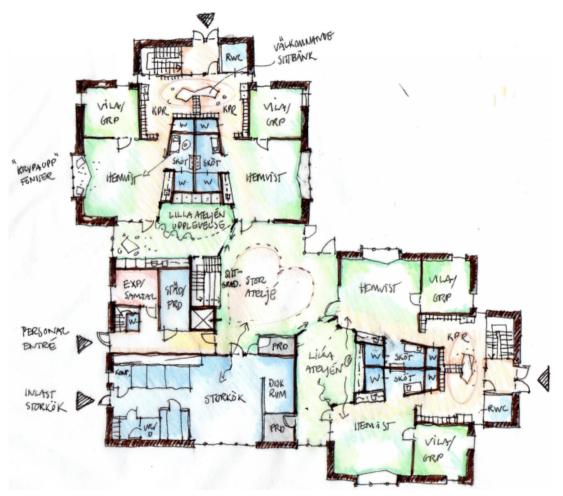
Model preschool Grönskan – first floor sketch (Liljewall, Norconsult, 2016).
